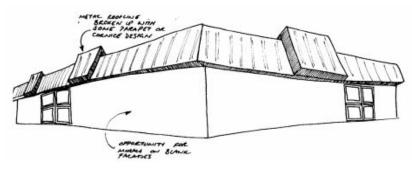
Building architecture that includes blank walls as facades of single structural or cladding type construction materials as glass, block work or corrugated sheet metal is strongly discouraged.
